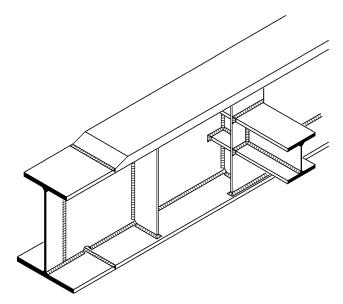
Plate girder with stiffeners and frame cross girder.
